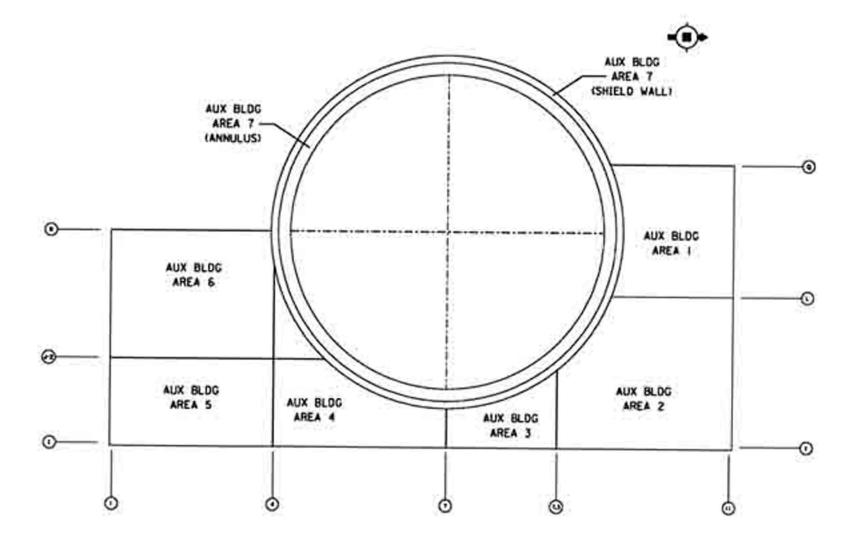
H.2-1 [General Layout of Auxiliary Building]
